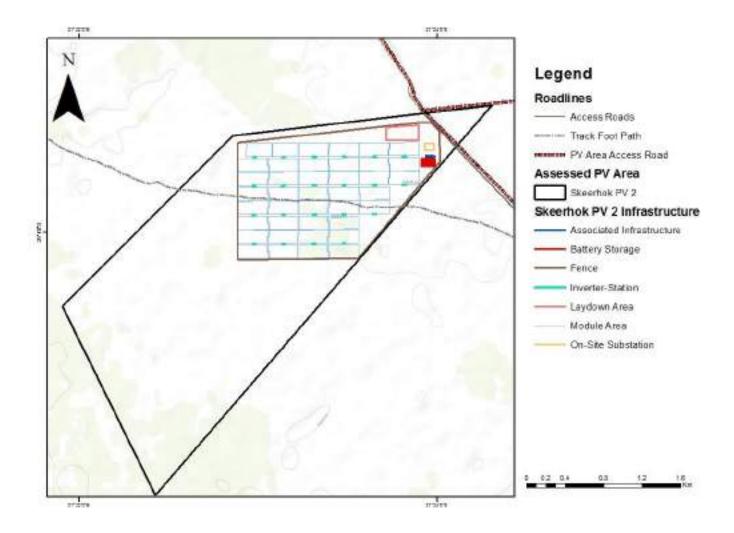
Proposed Site Layout of the Skeerhok PV 2 Facility
